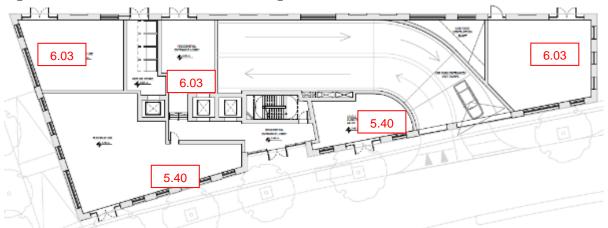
Ground flood FFL Plan: Building B10 – Retail and sub-station
